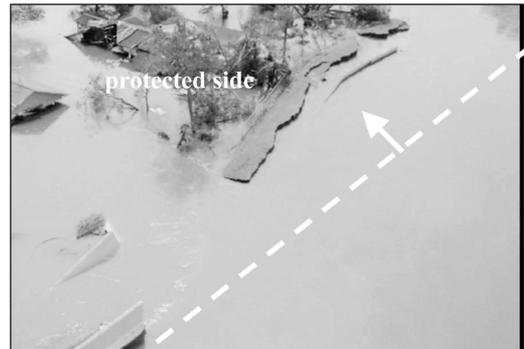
Failure of 17th Street Canal (modified after ILIT 2006).
